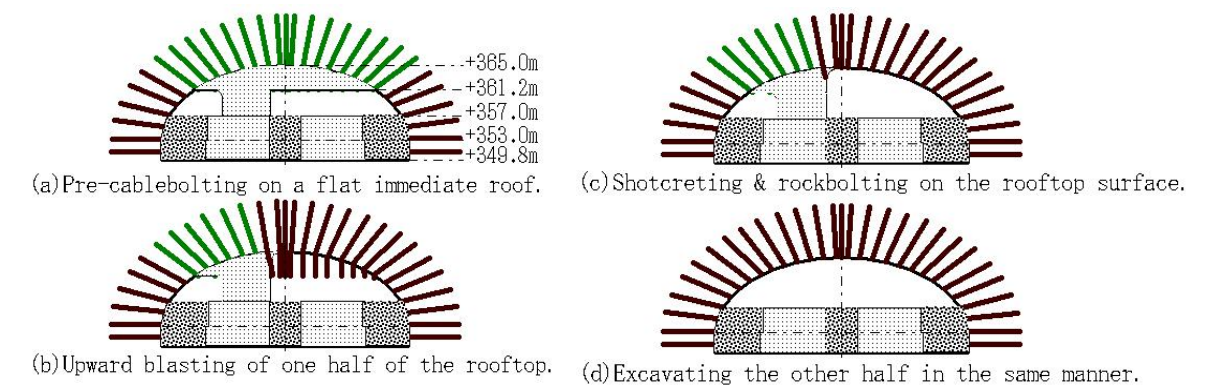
Excavation procedure for the rooftop of the cavern with pre-cablebolt installation.
